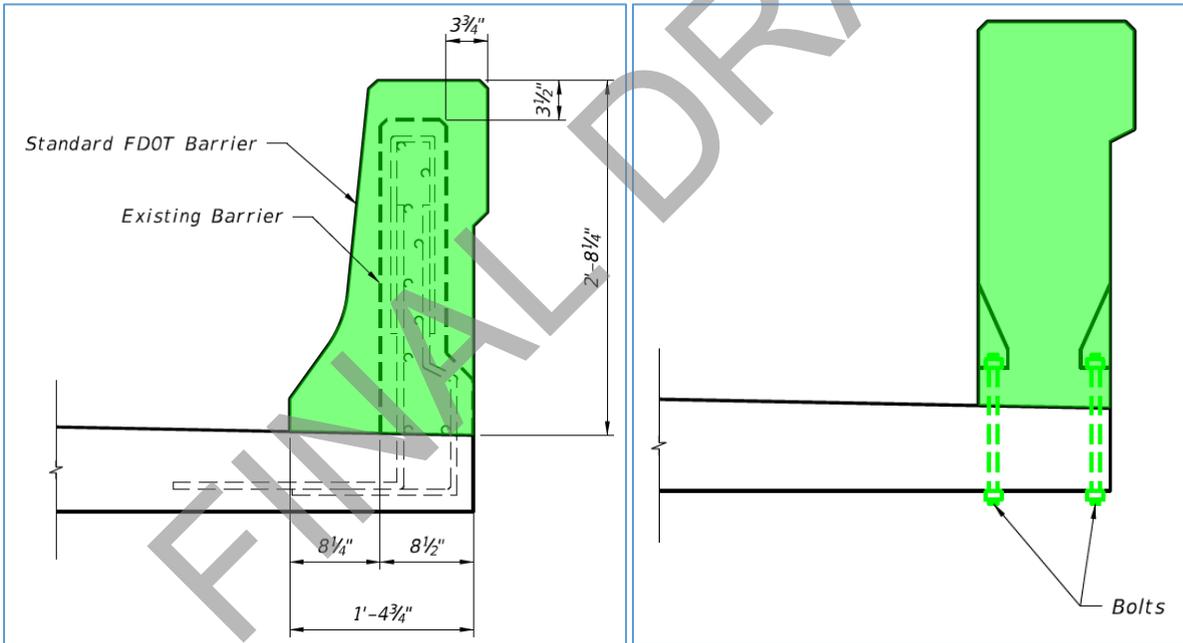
STANDARD FDOT AND EXISTING BARRIER (LEFT) & POTENTIAL DECK BOLTING DETAIL (RIGHT)
